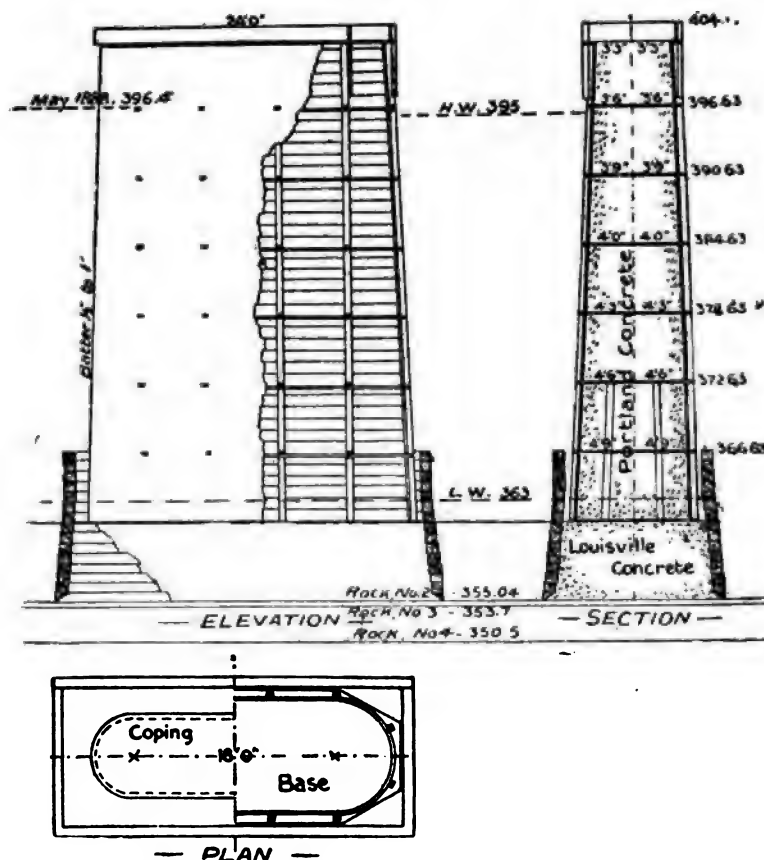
CONCRETE PIERS. RED RIVER BRIDGE.
